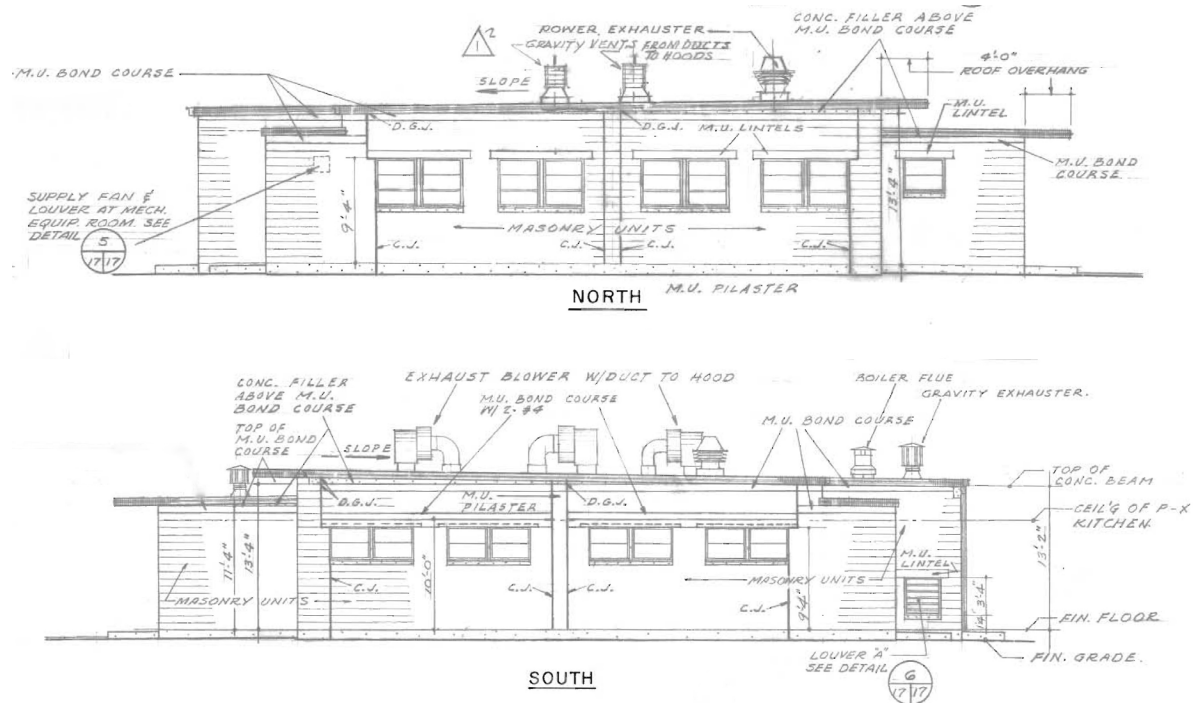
Property 23632, north and south elevations from 1959 WS-IE plans.
